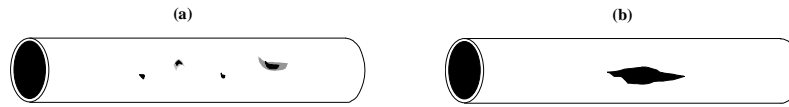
(a) corrosion pitting and (b) blow-out hole
